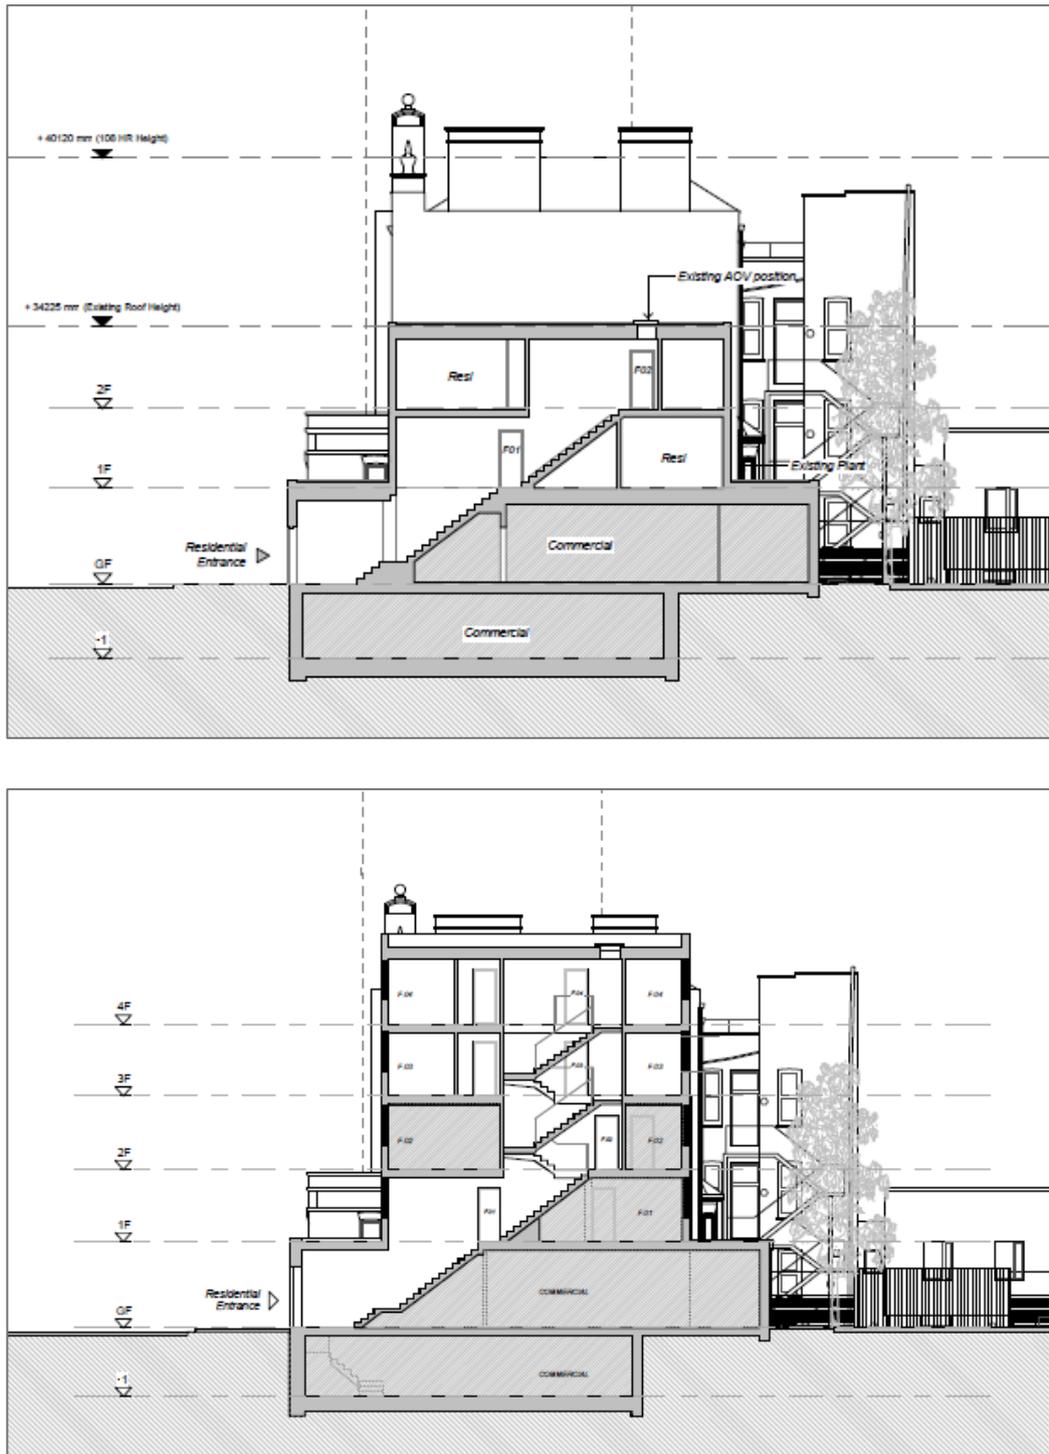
Existing site section (top image) and proposed site section (bottom image).
